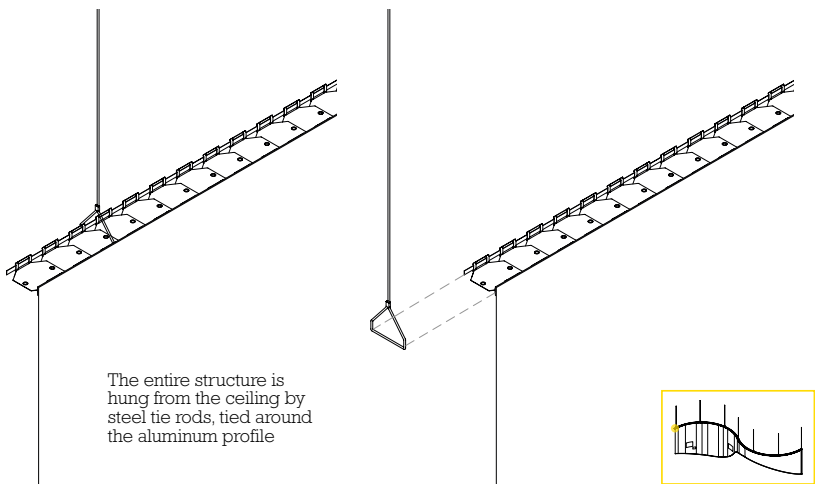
Construction detail - The supporting structure in hanging | Axonometric view.
